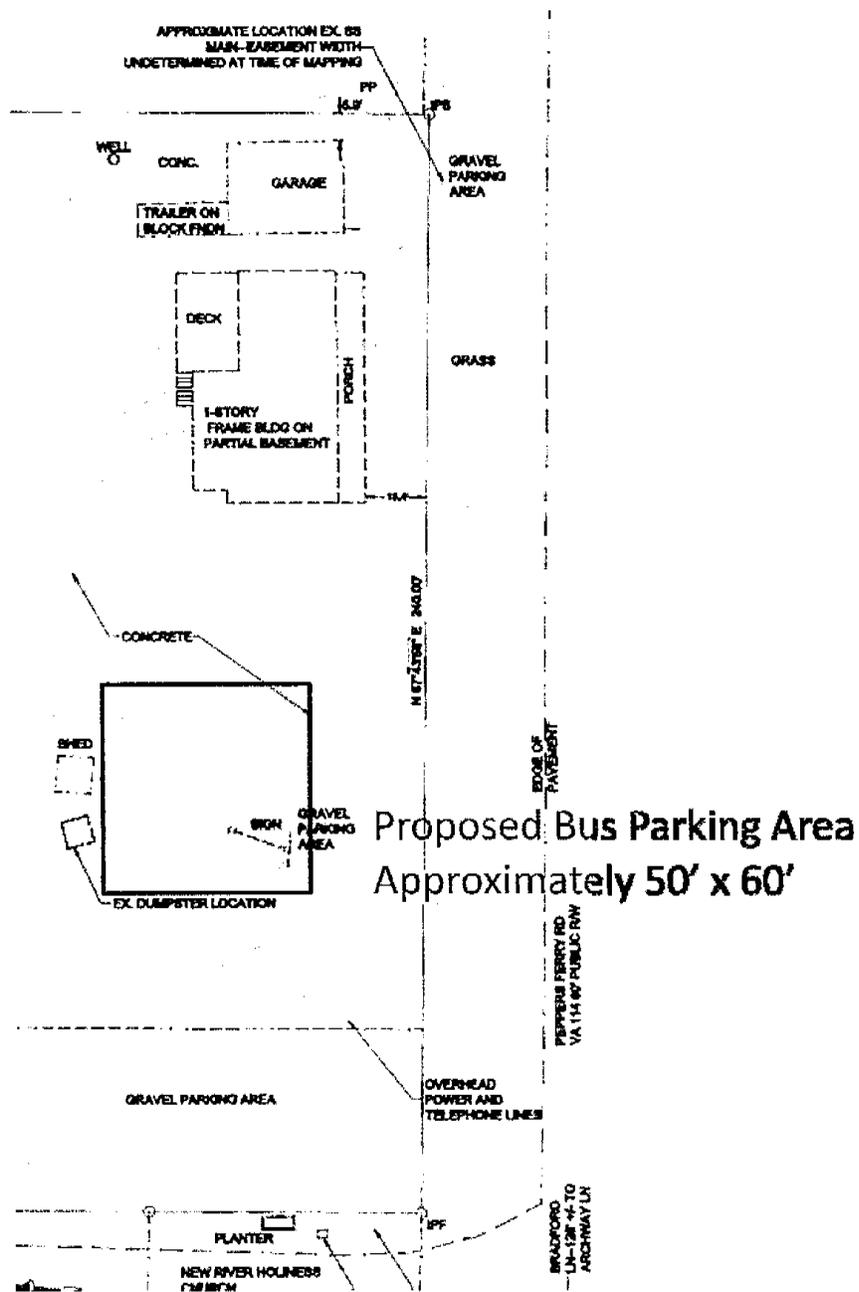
Proposed Bus Parking Area as Taken from Existing Site Plan (Dated 10/26/2010)
